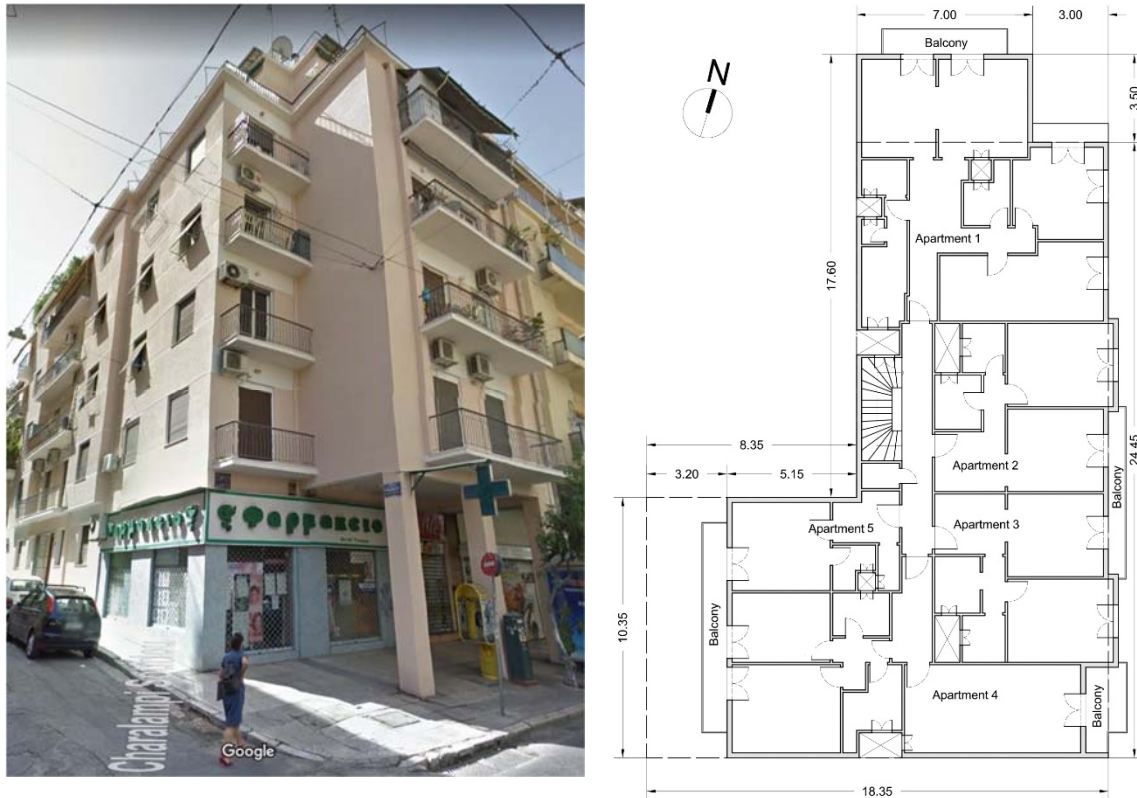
'Google Street View' of the case study building [37] (left), Level 3 floorplan (right).
